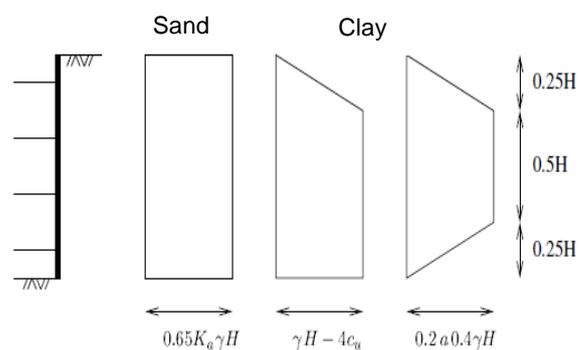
Earth pressures diagram acting in flexible retaining wall
